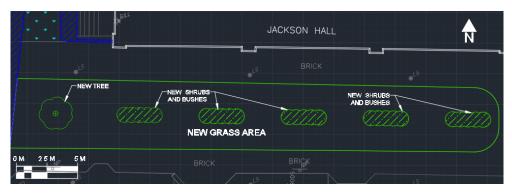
New Alleyway Design Between Jackson and Old Medical Building
